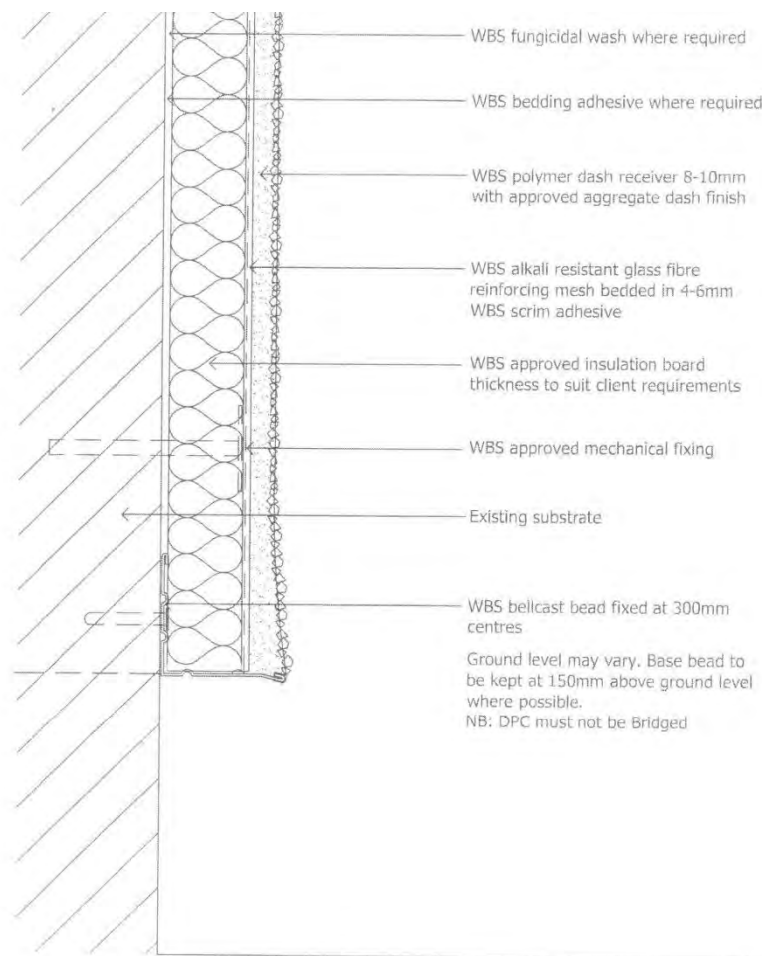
Pavement to wall junction detail provided to the housing association by the manufacturer
